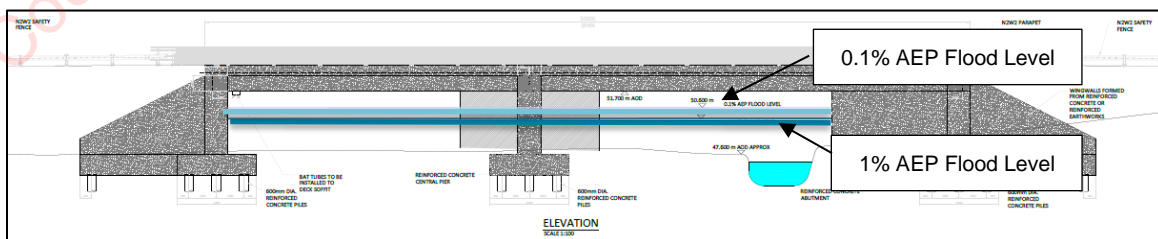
Post-development Flood Levels for Road Bridge 1
